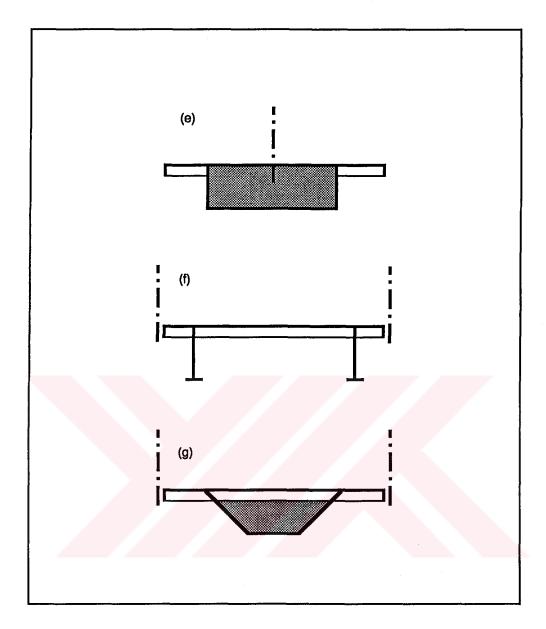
TYPES OF STIFFENING GIRDERS GIVING INDIRECT CONNECTION TO THE CABLES
